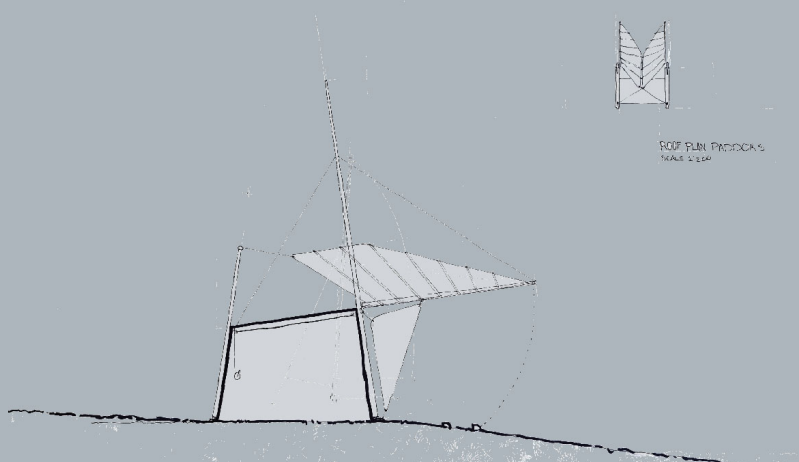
Sailing School Plan 4 (not to scale)(not final)
